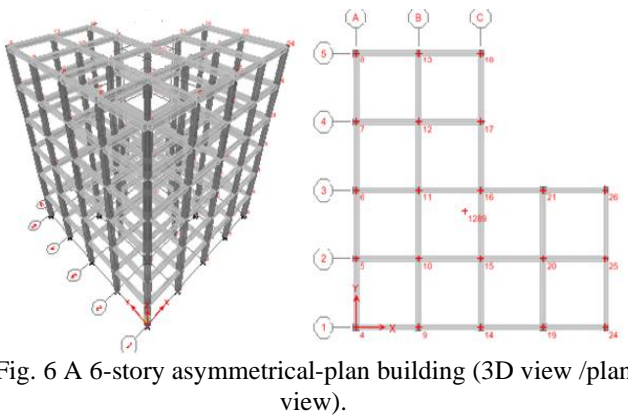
A 6-story asymmetrical-plan building (3D view /plan view).
